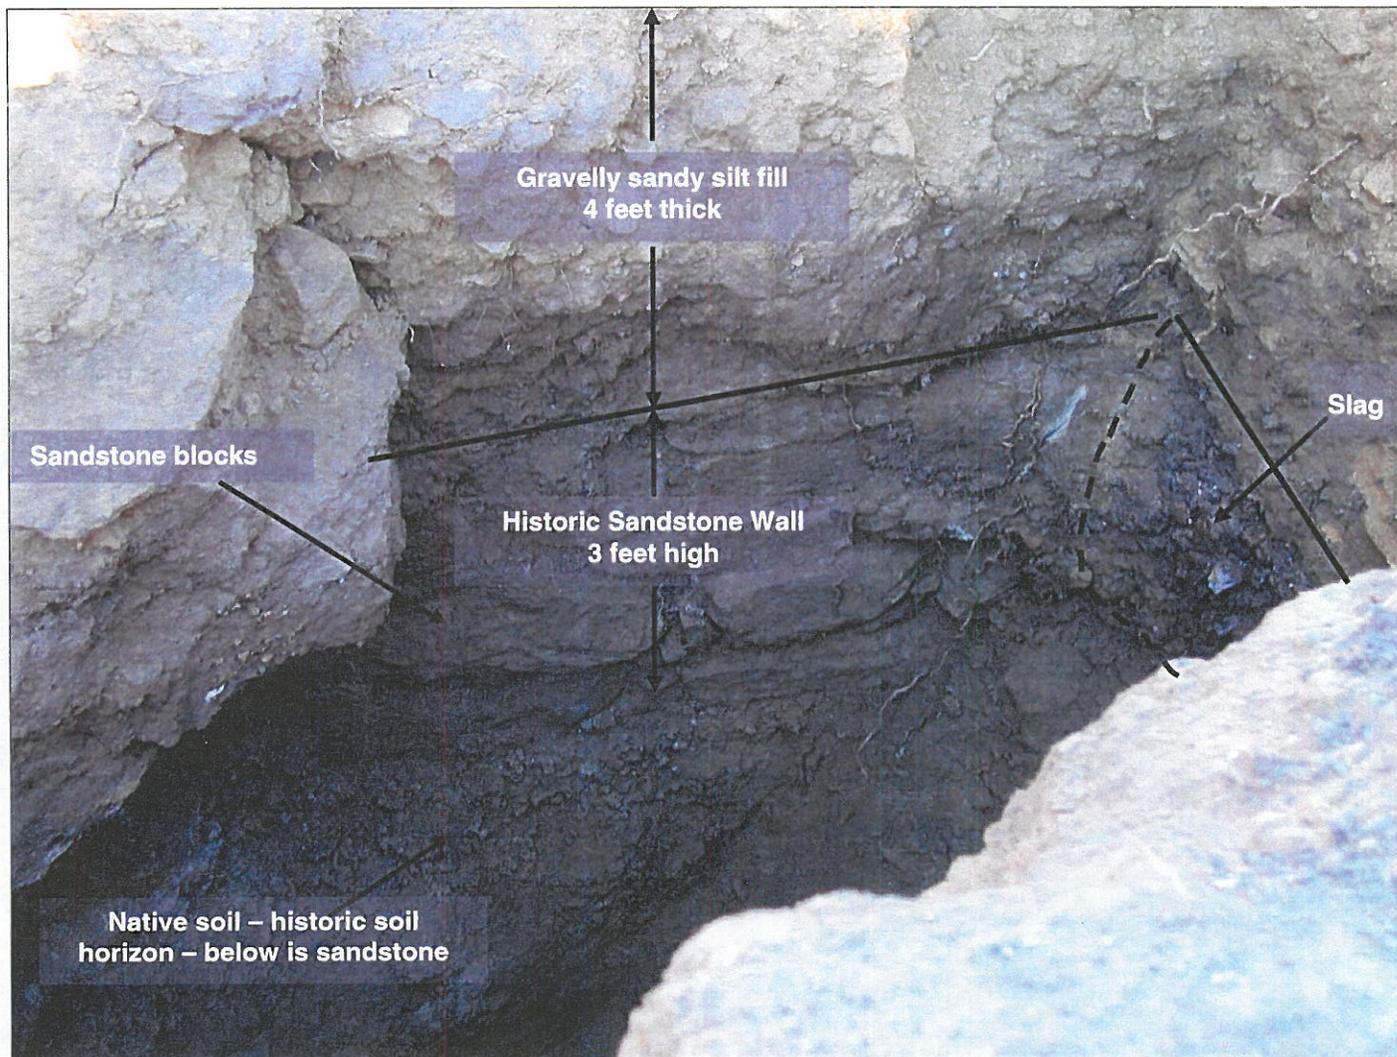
Looking on the northeast wall of test pit L002TP001. Shows fill material, some refuse and a sandstone wall that was a retaining wall for an old road that was used in the early 20th century. Photo taken 2/7/2001.
